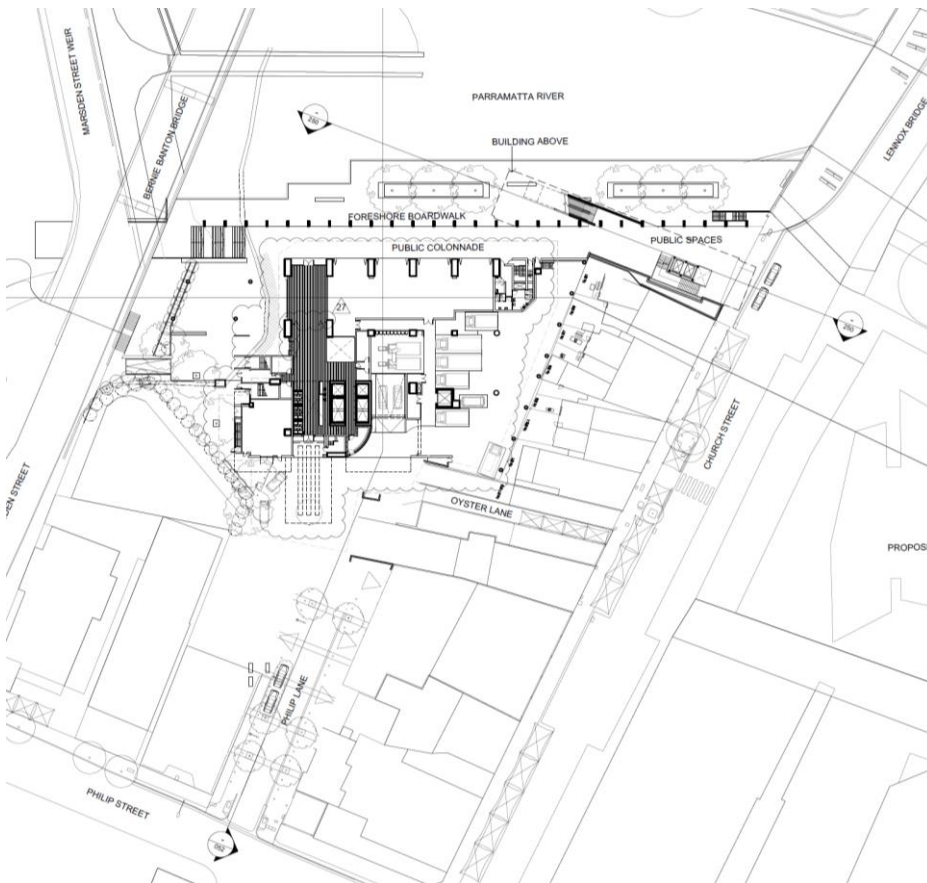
Proposed Modified Site Plan (Source: Marchese Partners, 2018)
